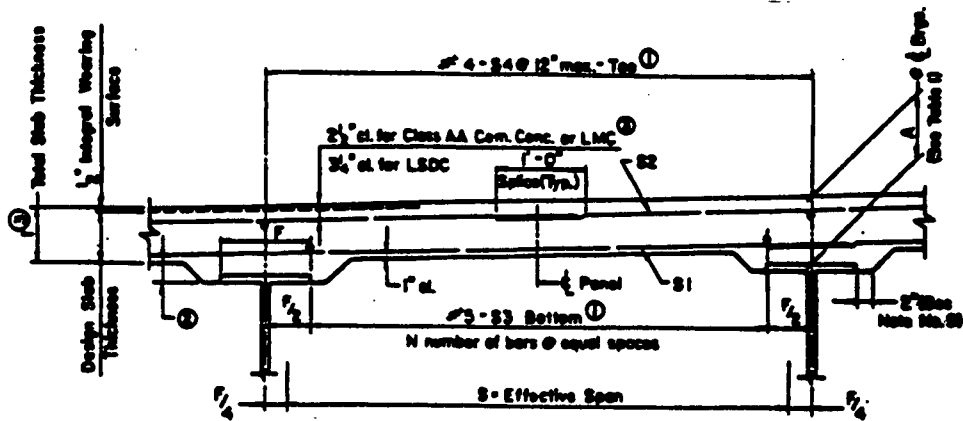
A: Typical Slab Panel (Simple Span Bridges)
